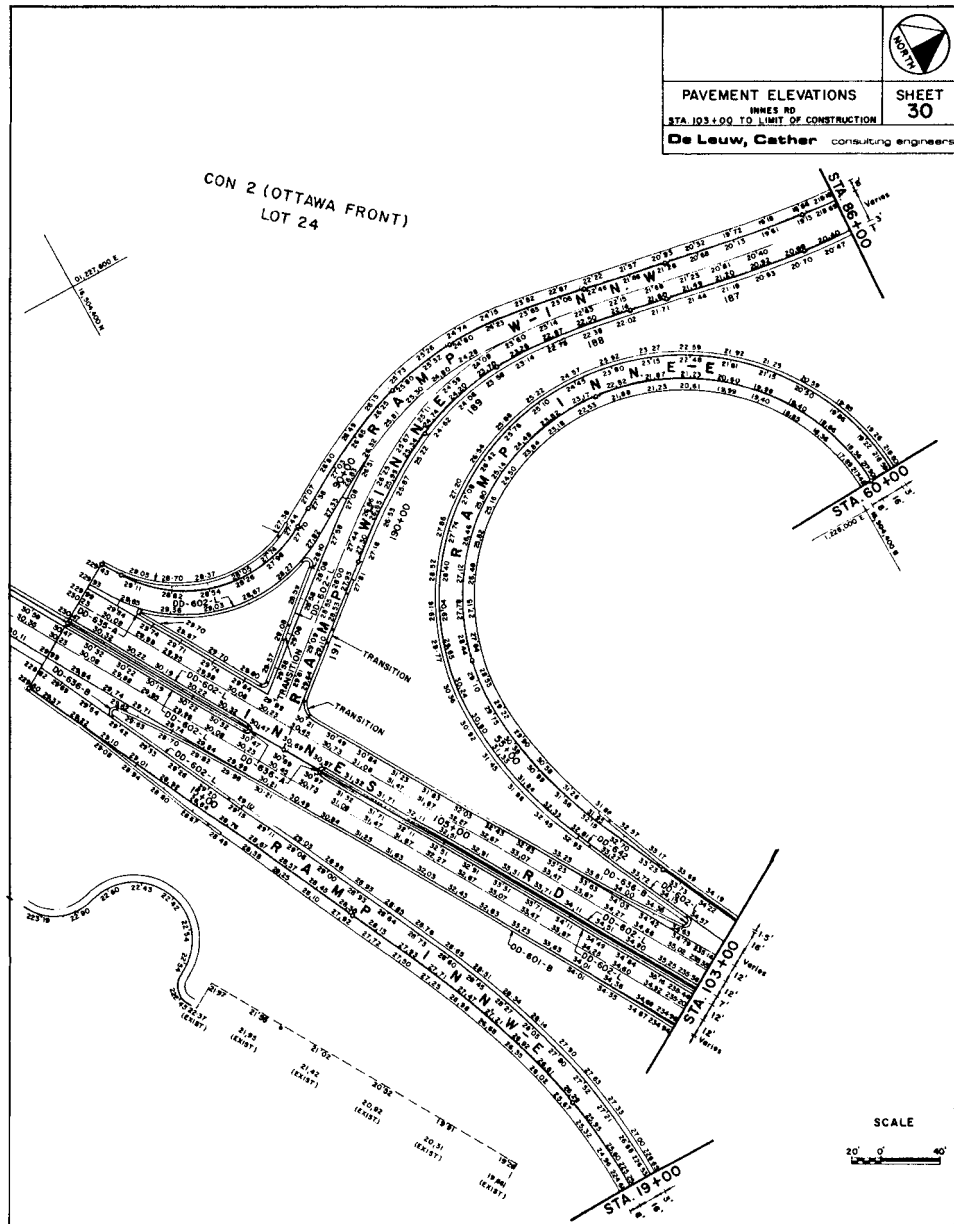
Interchange plan showing full-width pavement elevations at 25-ft station intervals.
